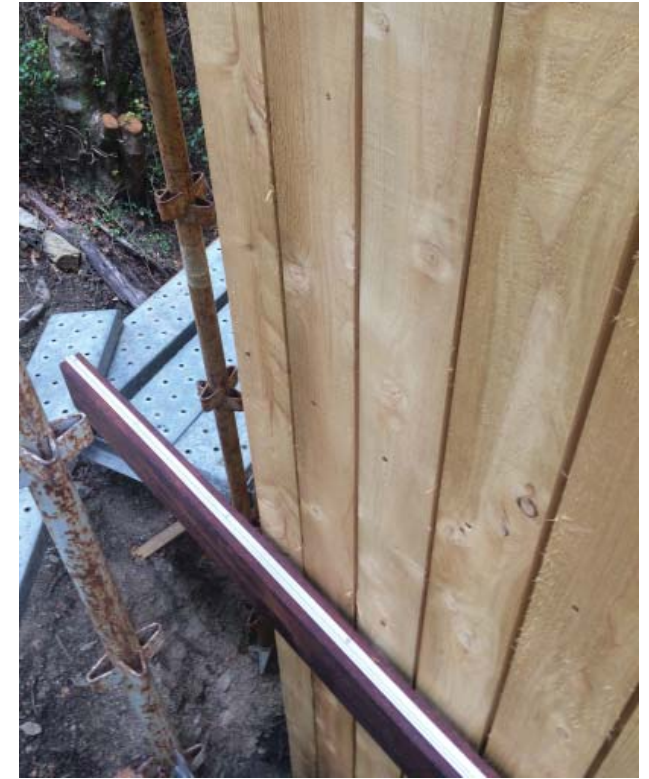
Installation of over wall tracks and rollers for joinery units outside the cladding line.
